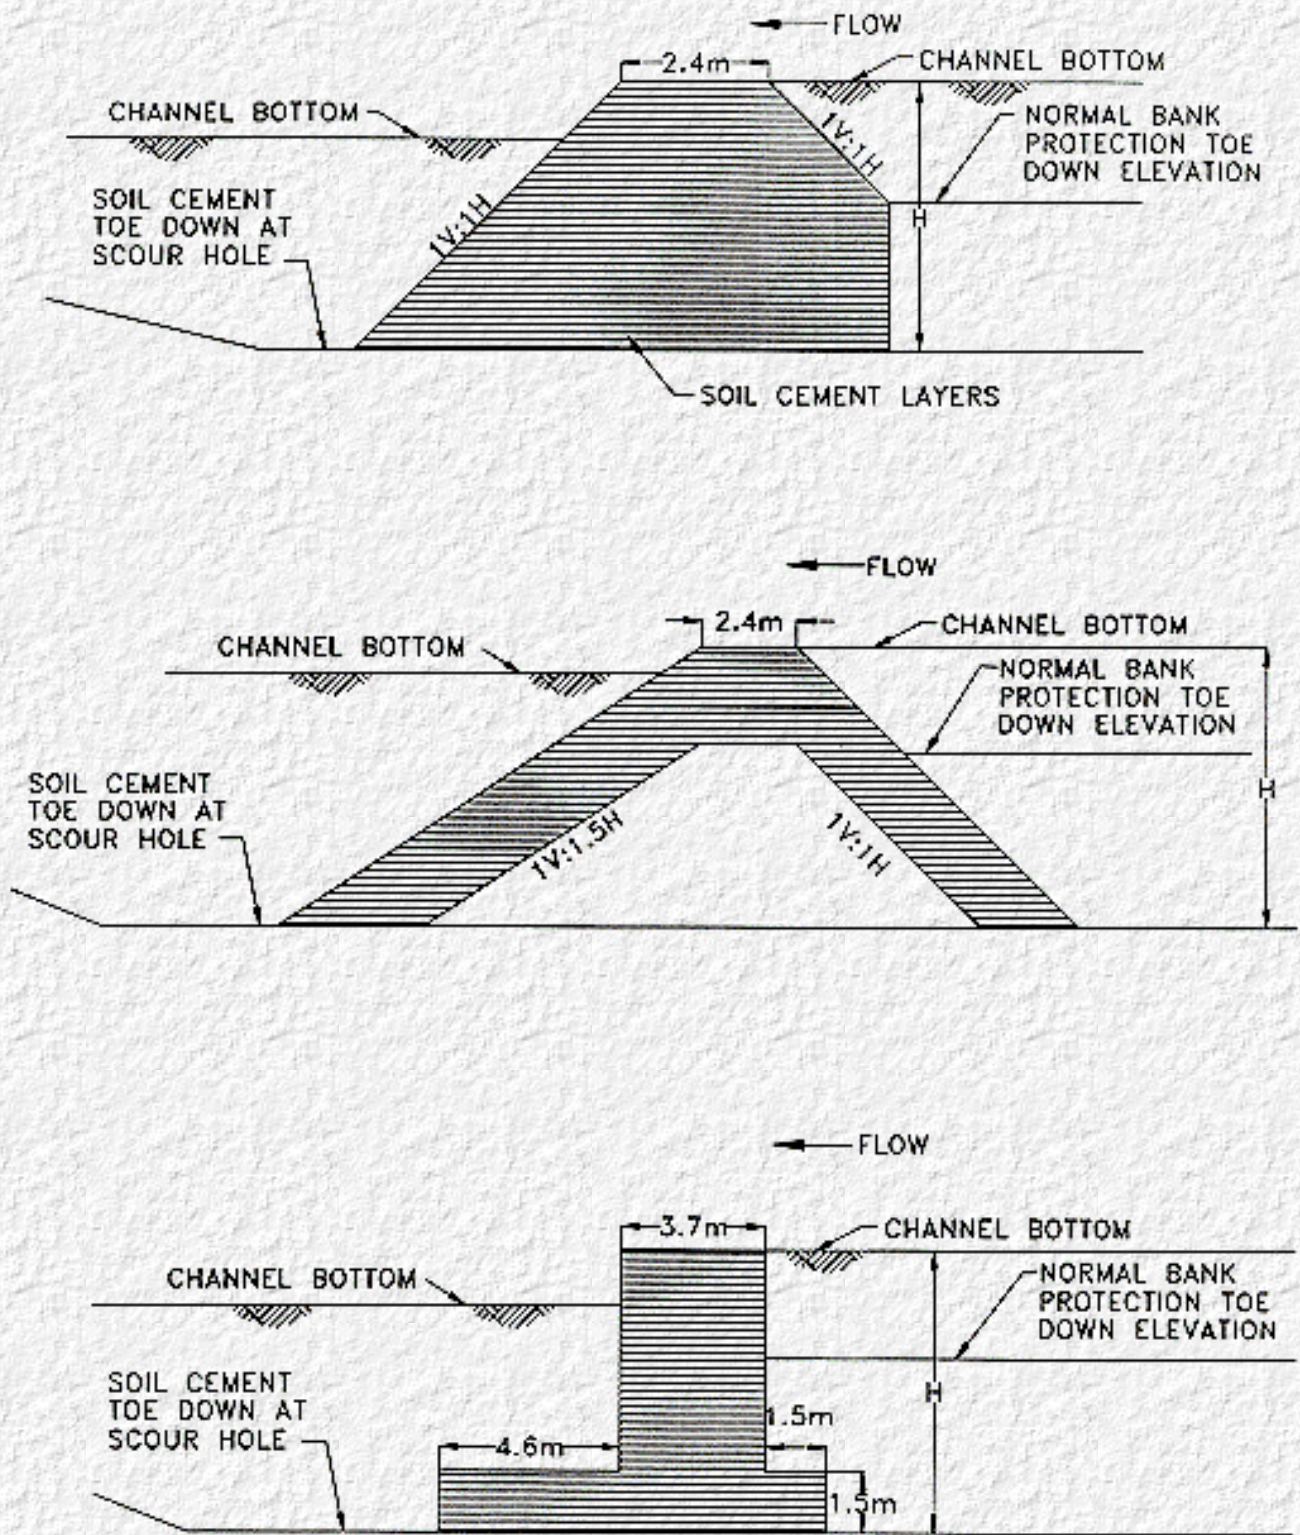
Typical Sections for Soil Cement Grade Control Structure (PCA)
